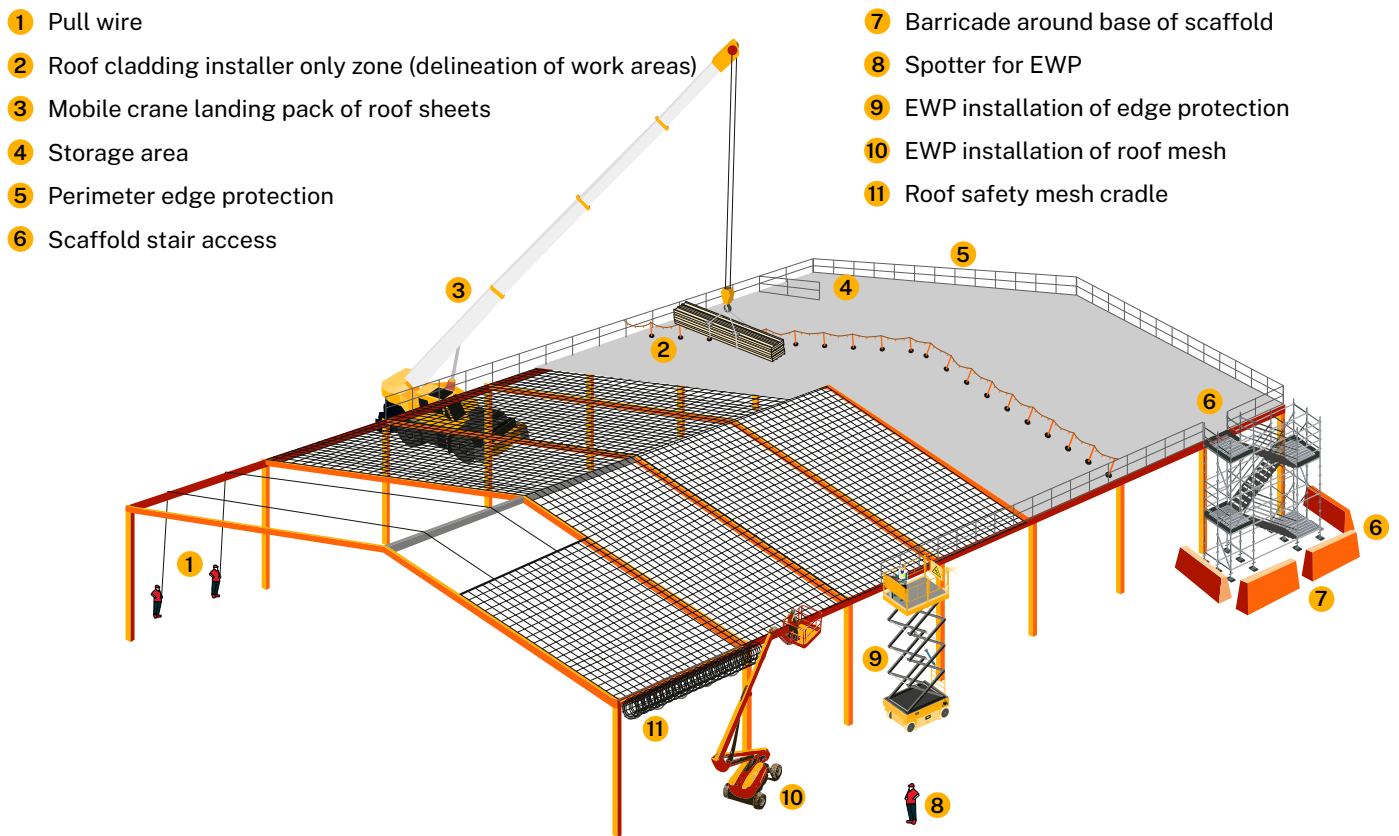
Examples of roof access methods and work on roof control measures during industrial metal roof construction
